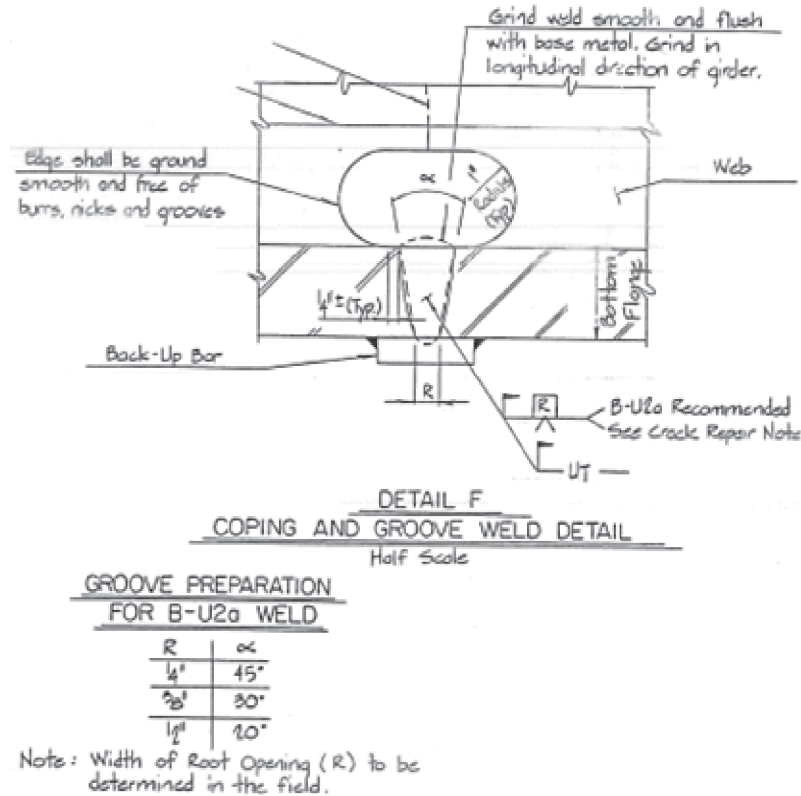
Connecticut DOT CJP weld repair sketch.
